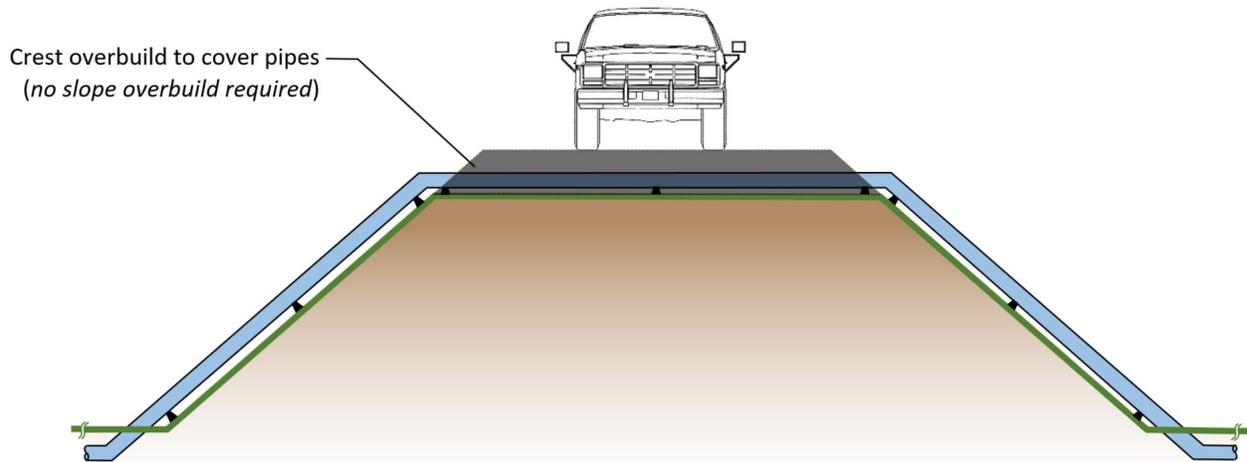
Some crests are wide enough that overbuilding the slope is not required.
